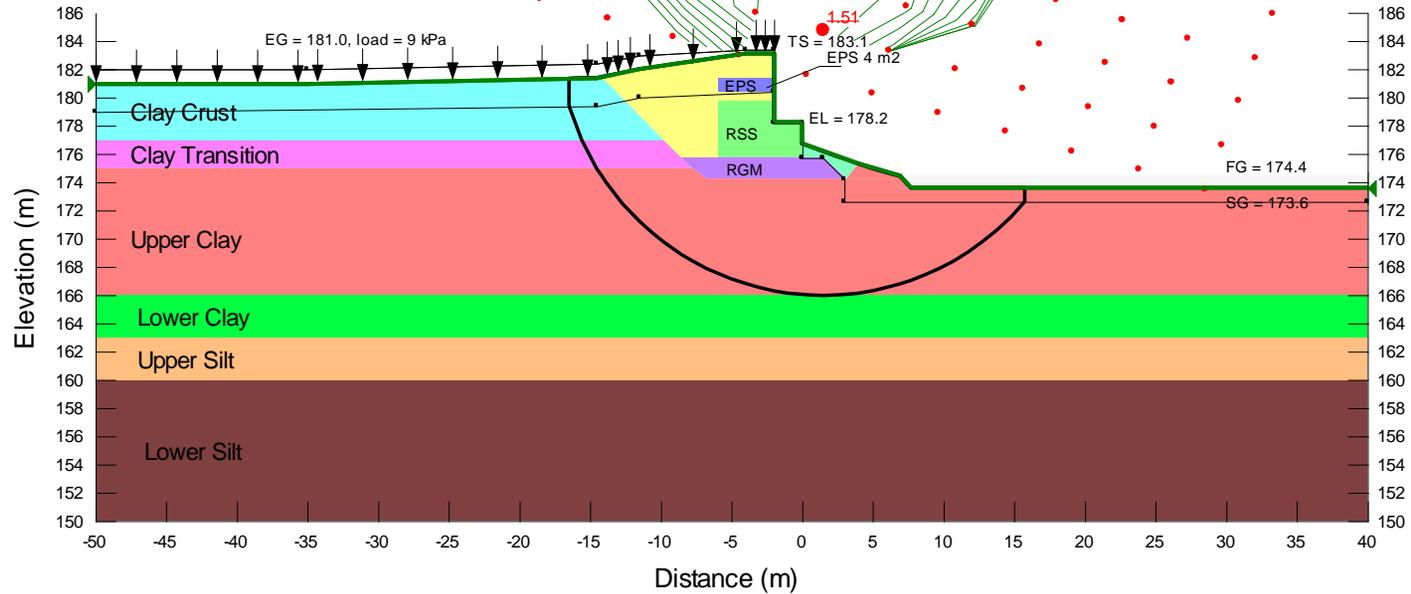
Global Stability Result – South Abutment (10+150) – End of Construction (Undrained) Loading
